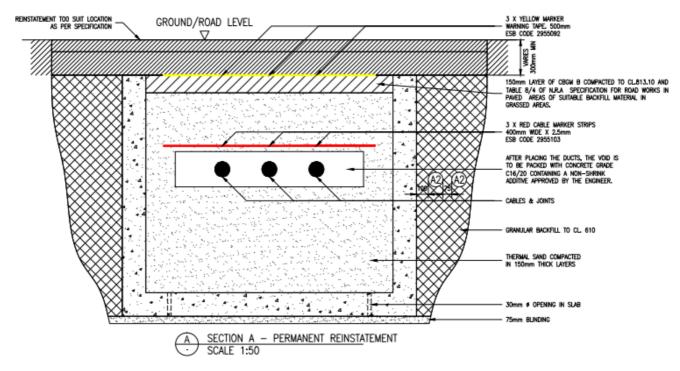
Cross-section of typical joint bay installation. (Source: EirGrid XDC-CBL-STND-H-012 Sheet 007)
